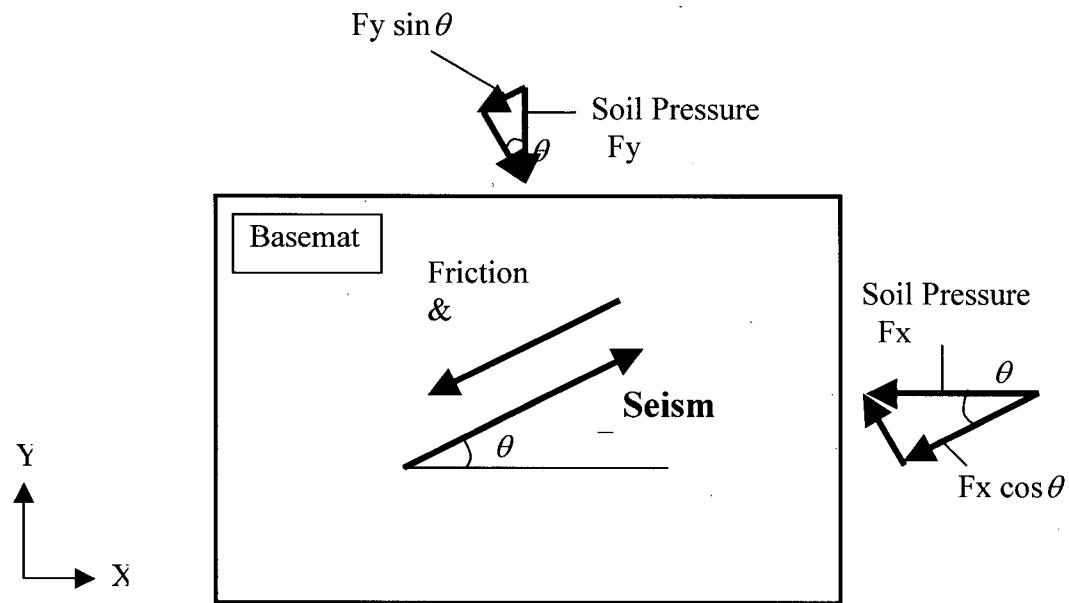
(1) Horizontal Forces in Sliding Evaluation (Basemat Plan)
